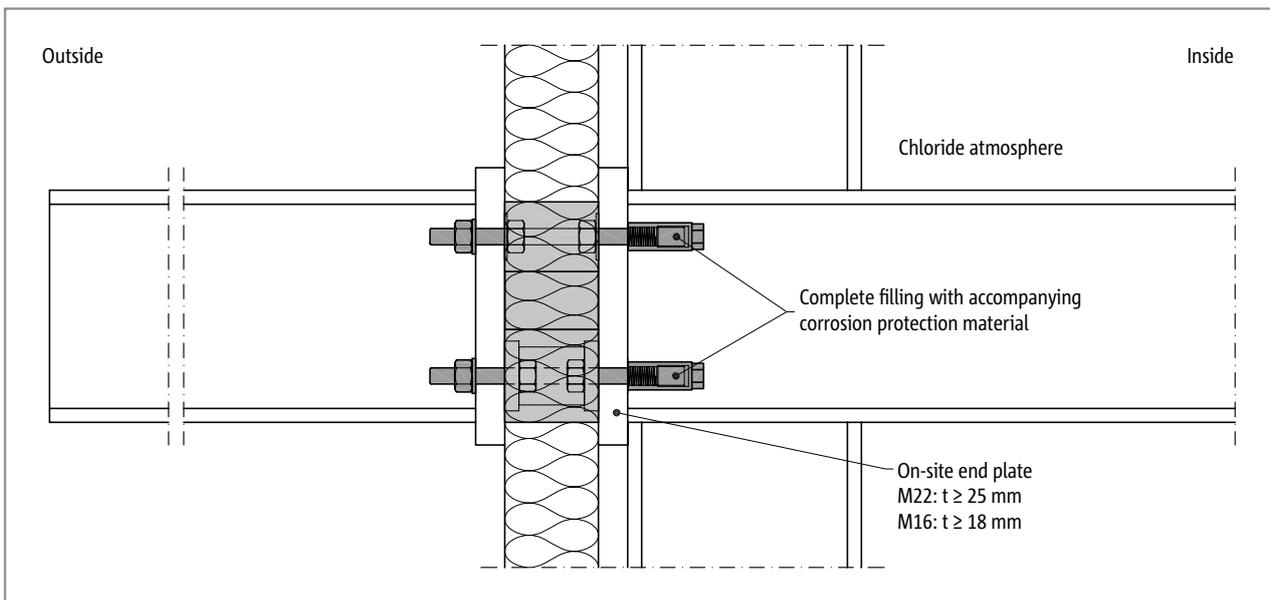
Schöck Isokorb® T type S with cap nuts: Cantilevered steel construction; interior atmosphere containing chloride
